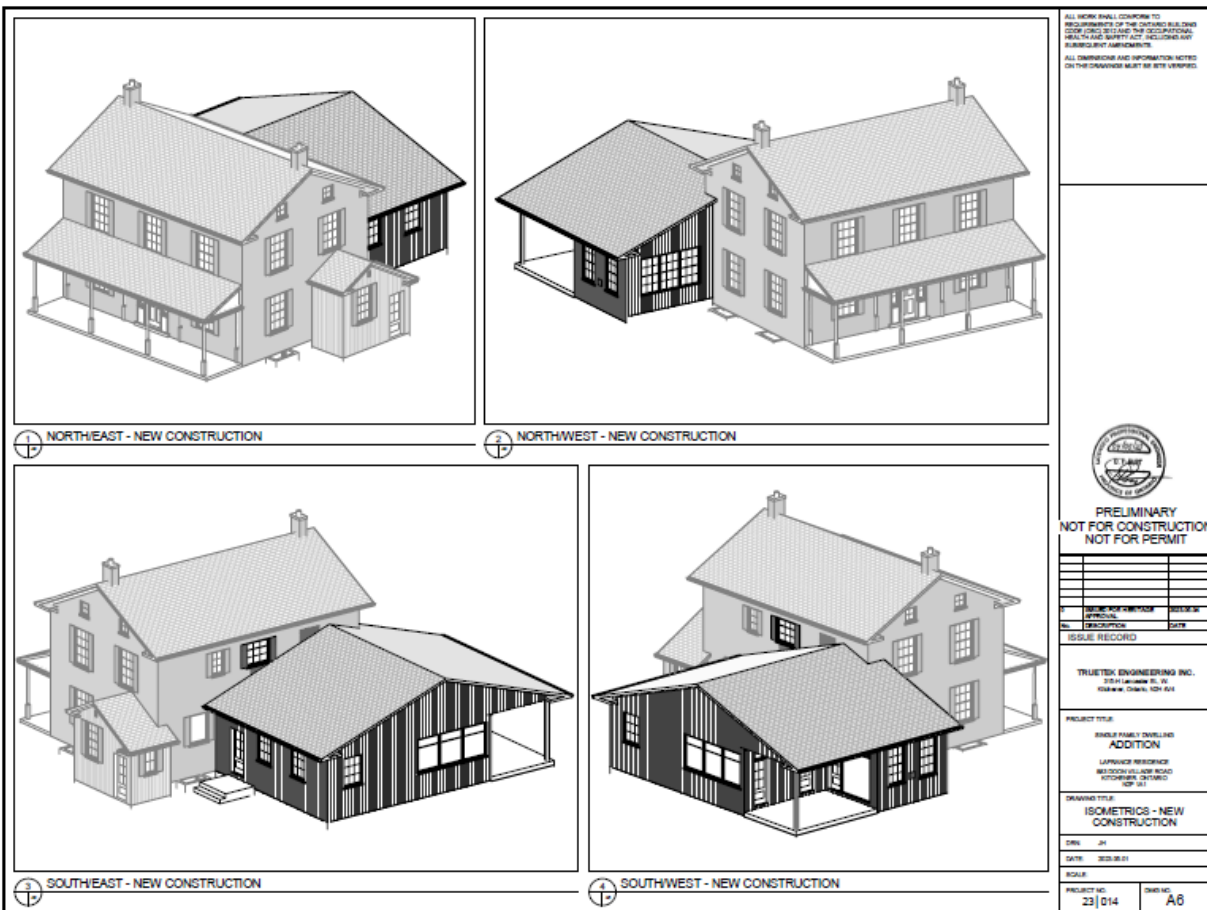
3D Renderings of Proposed Rear Addition - All Elevations
